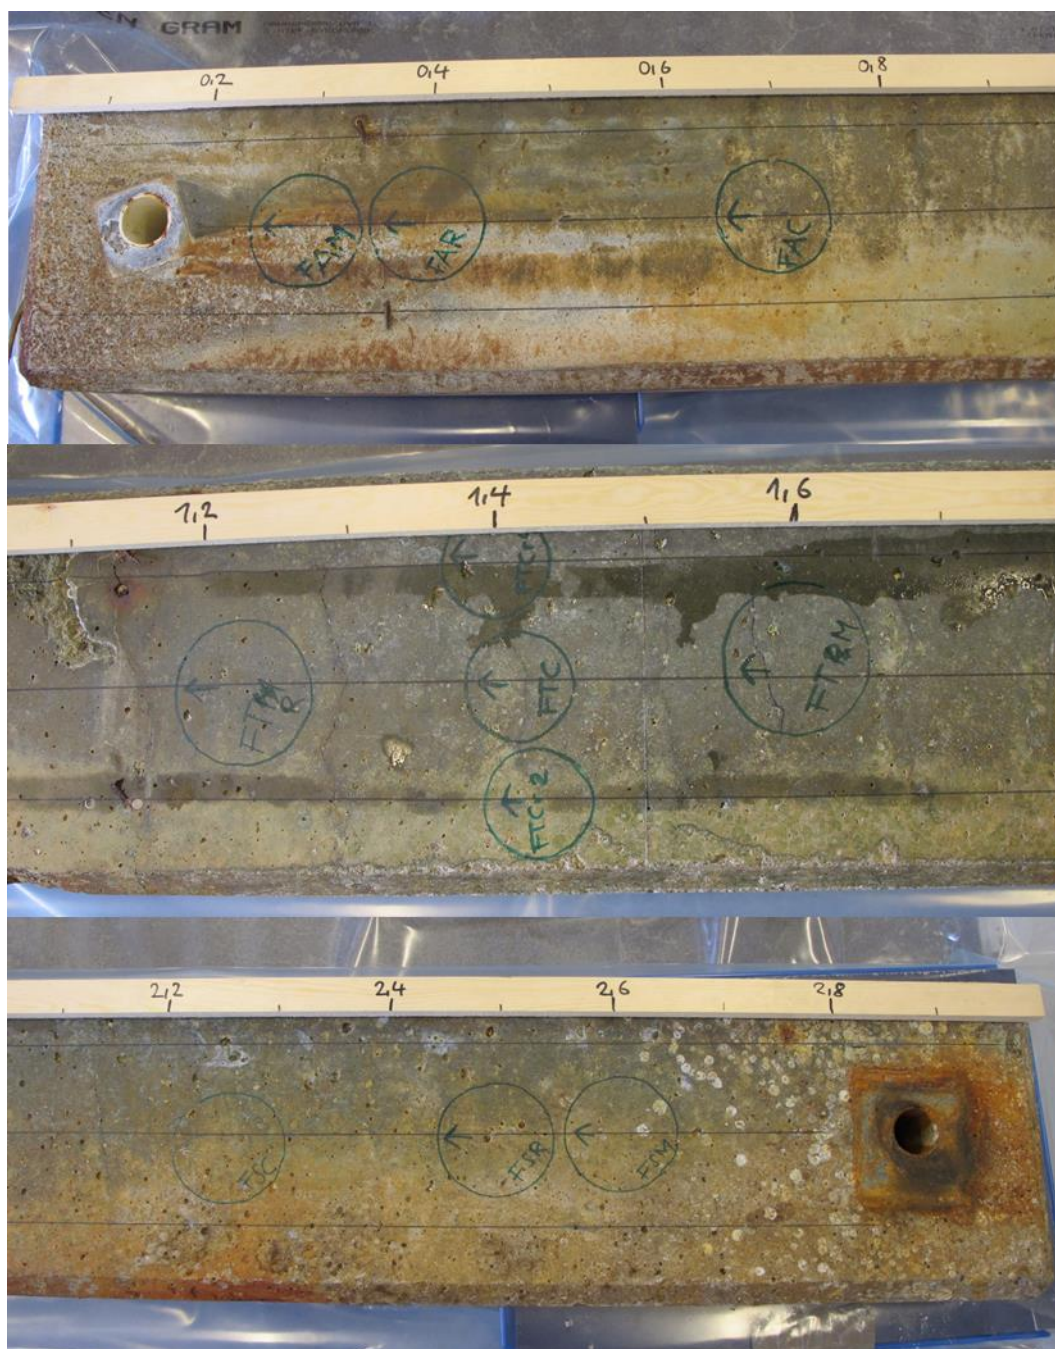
Location of concrete cores taken from Beam F, distance in meters (Photos: Eva Rodum)
